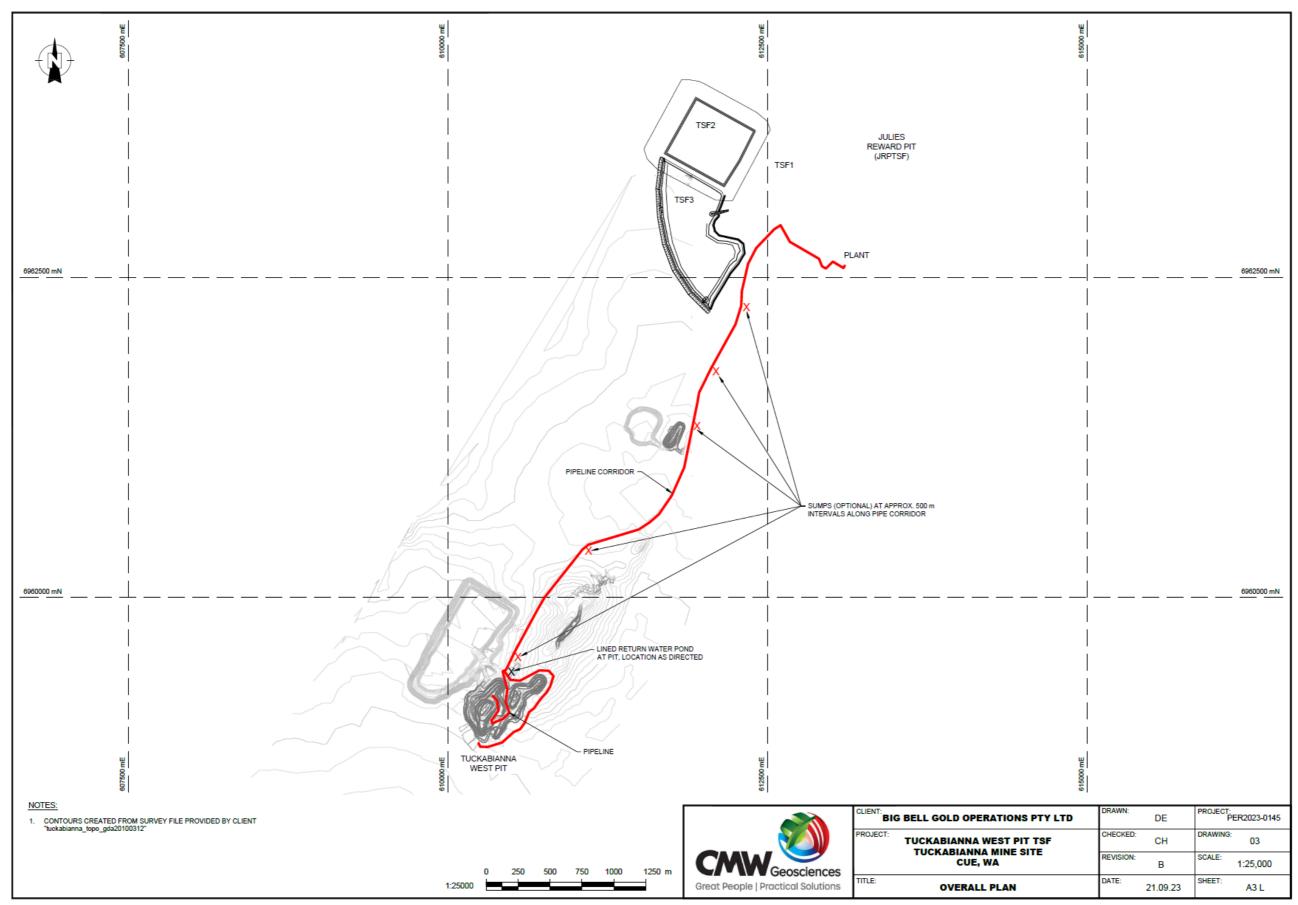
Tailings and return water pipelines, turkey's nests, and TWTSF return water pond site layout
